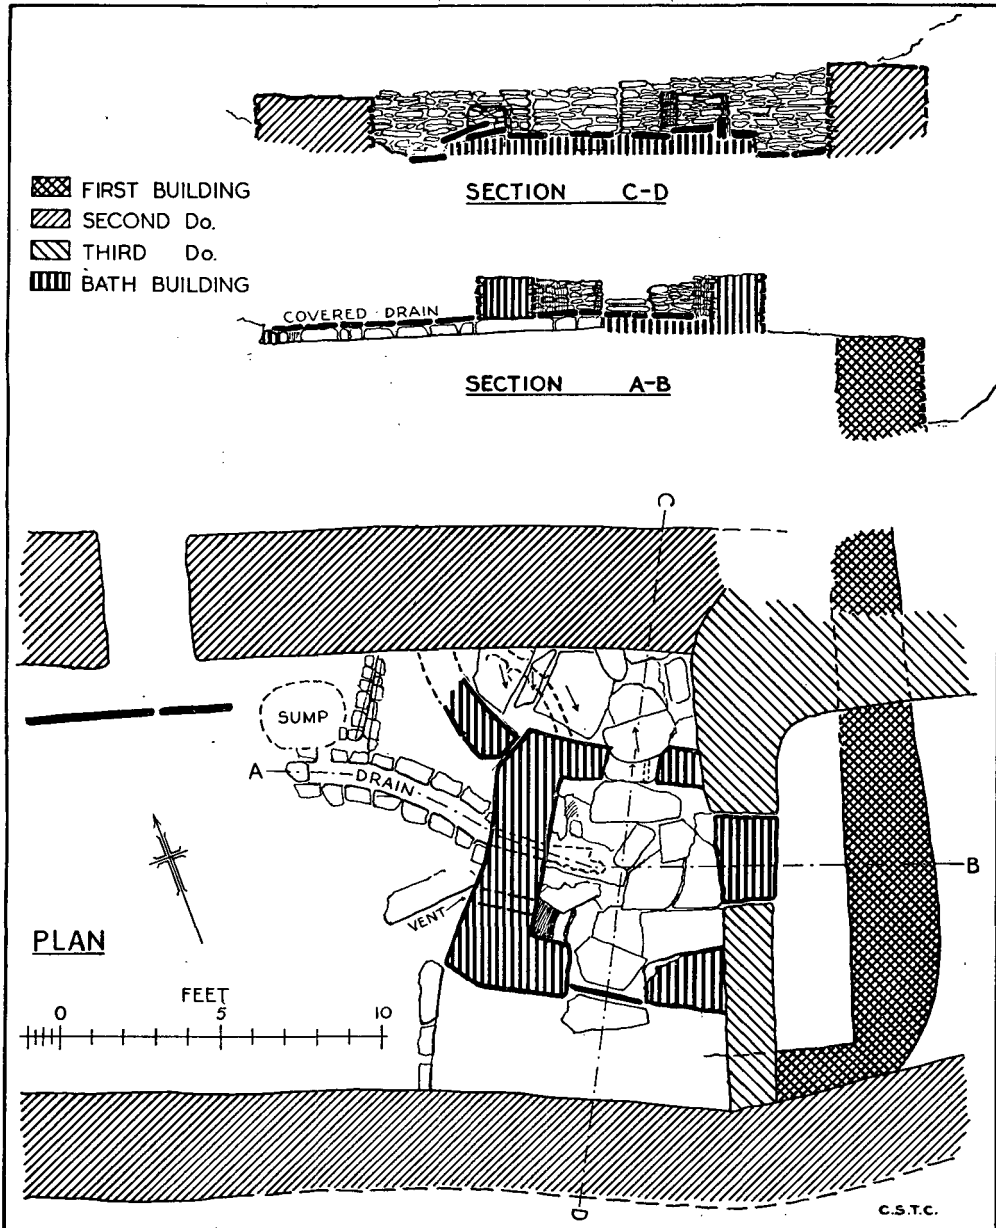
West end of I, showing Bath Chamber, Drain, and Vent, with sections, also Wall of earlier Building beyond.
